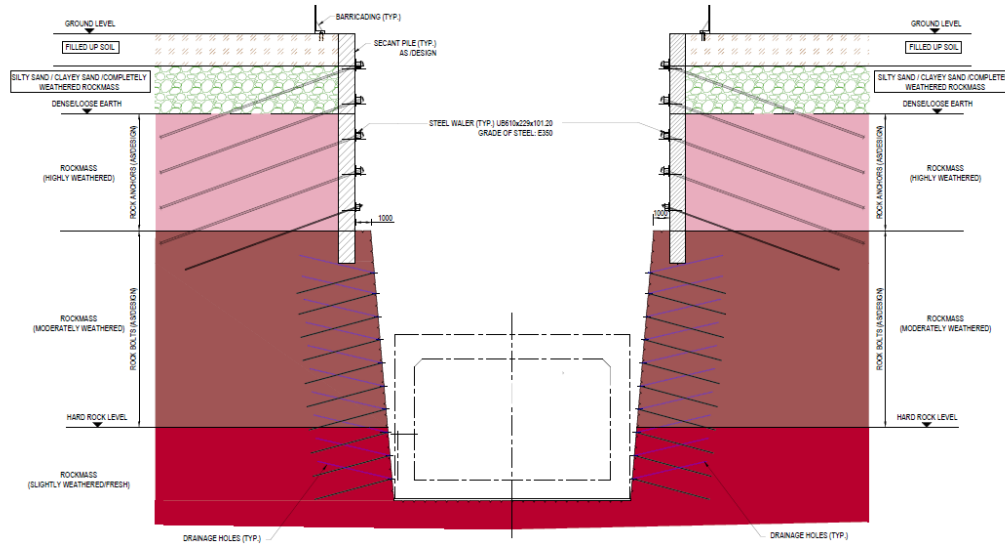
Typical Section of C&C & Ramp with Secant Pile
